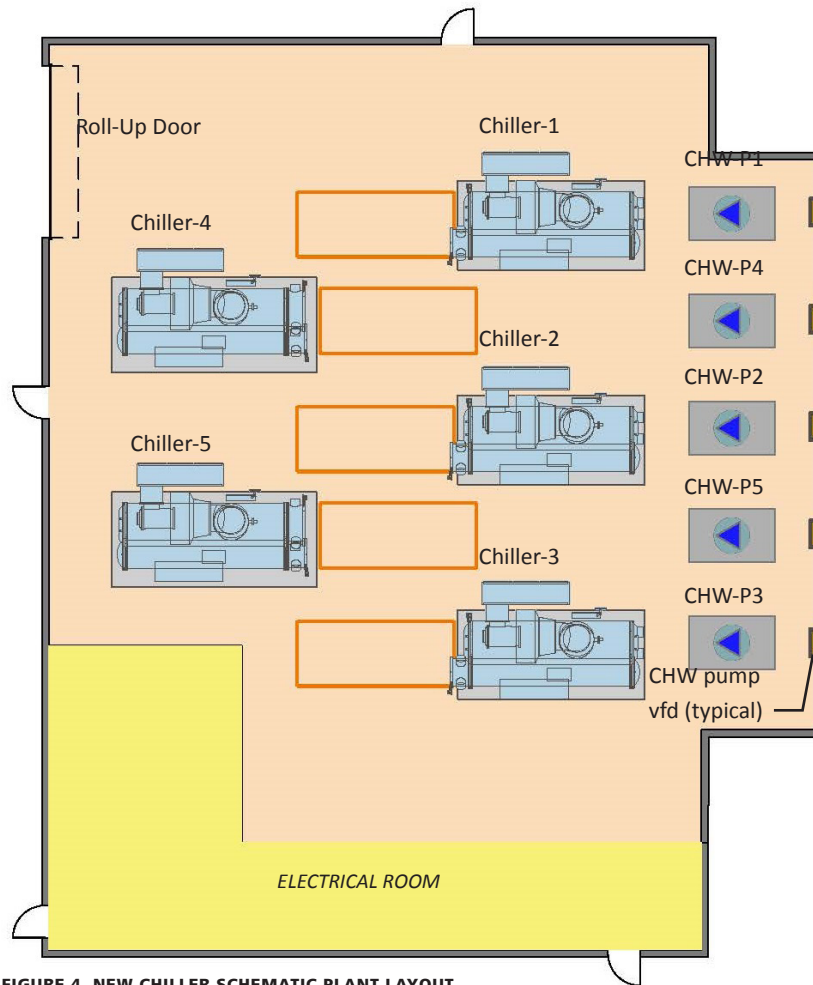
NEW CHILLER SCHEMATIC PLANT LAYOUT
